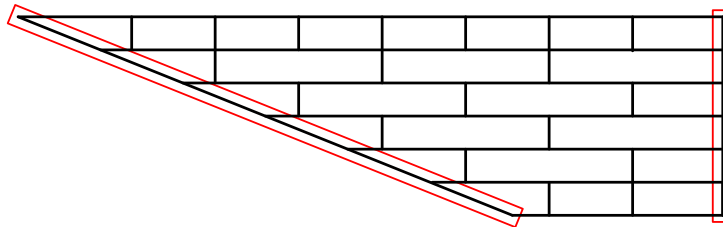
Beneficial Staggered Cross-Frame Framing Arrangement for a Straight Bridge with Non-Parallel Skew
